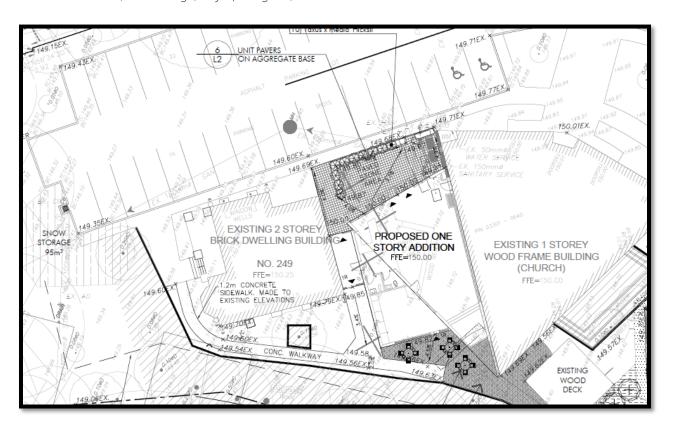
Proposed landscape plan (C.Y. Lee Architect Inc., 2019)
